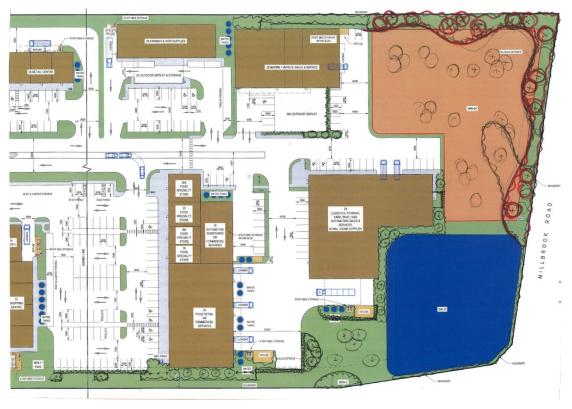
Sketch plan prepared by NK Landscape Architecture - October 2023
